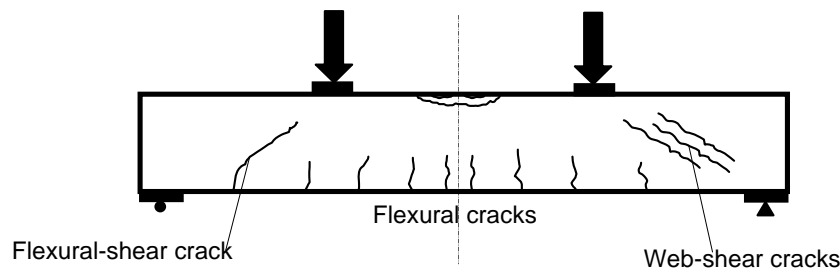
Flexural-shear crack and web-shear cracks caused by high shear stresses. Possible failure modes due to shear are either sliding in a shear crack or crushing of the concrete between two shear cracks.
